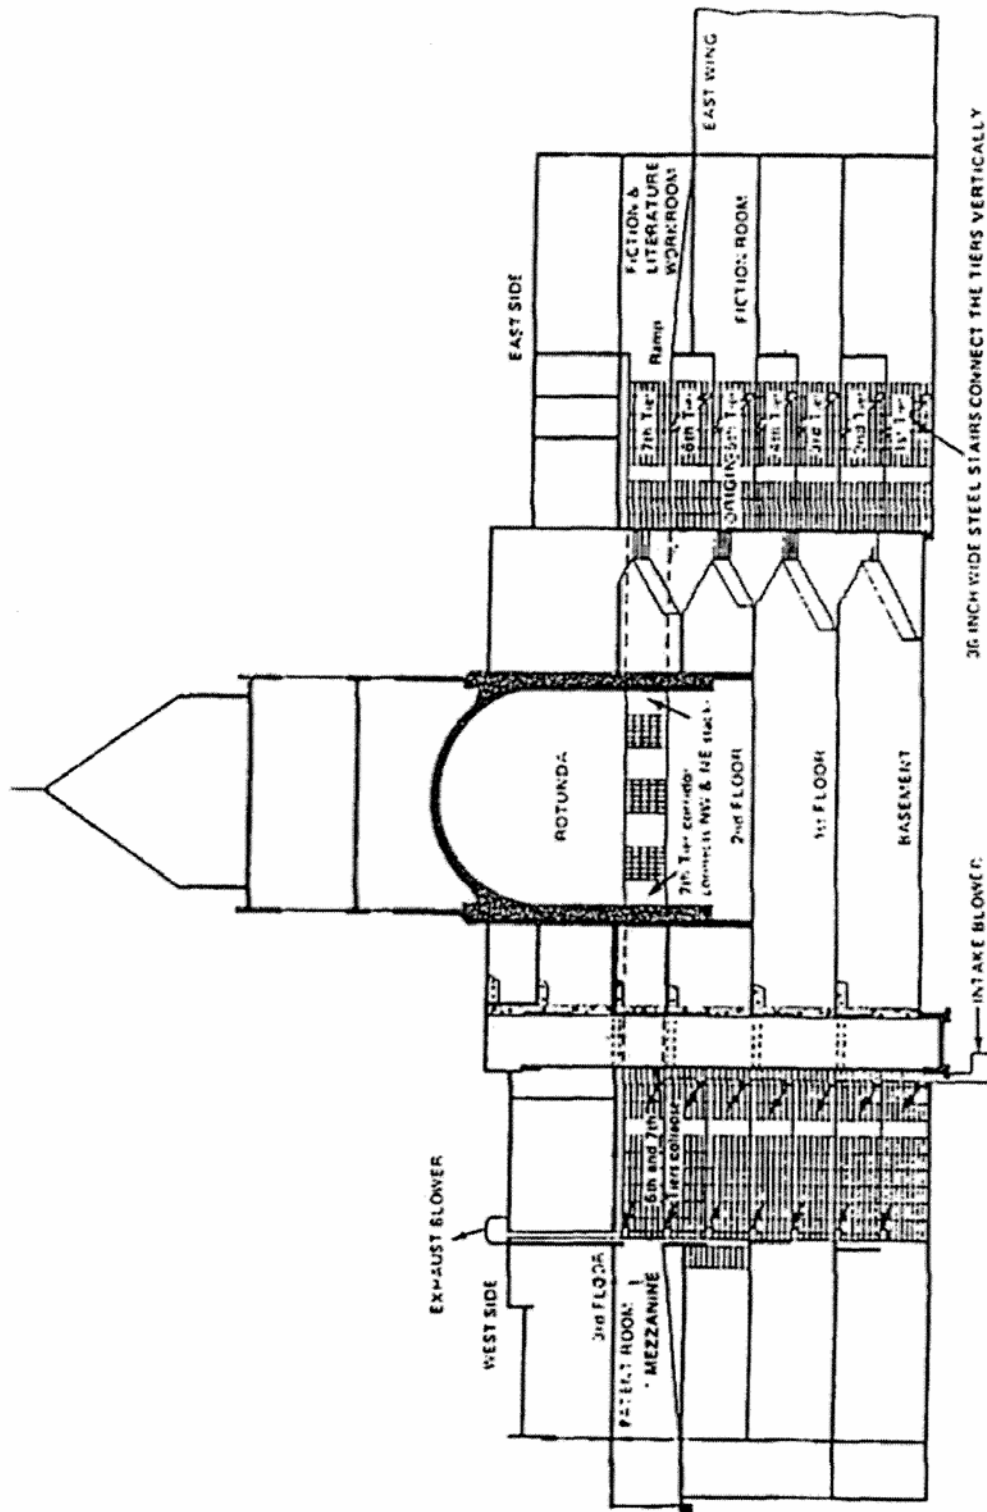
Side view showing stairways, connecting corridors, and areas of fire spread.
